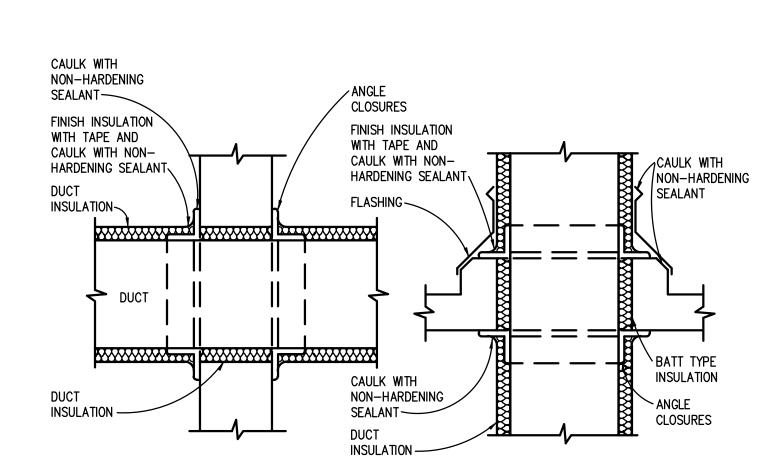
DETAIL INDICATES THE INSTALLATION REQUIREMENTS FOR A FIRE RATED ASSEMBLY. FOR A NON-FIRE RATED ASSEMBLY PACK SLEEVED OPENING WITH INSULATION MATERIAL AND CAULK WITH NON-HARDENING SEALANT.
